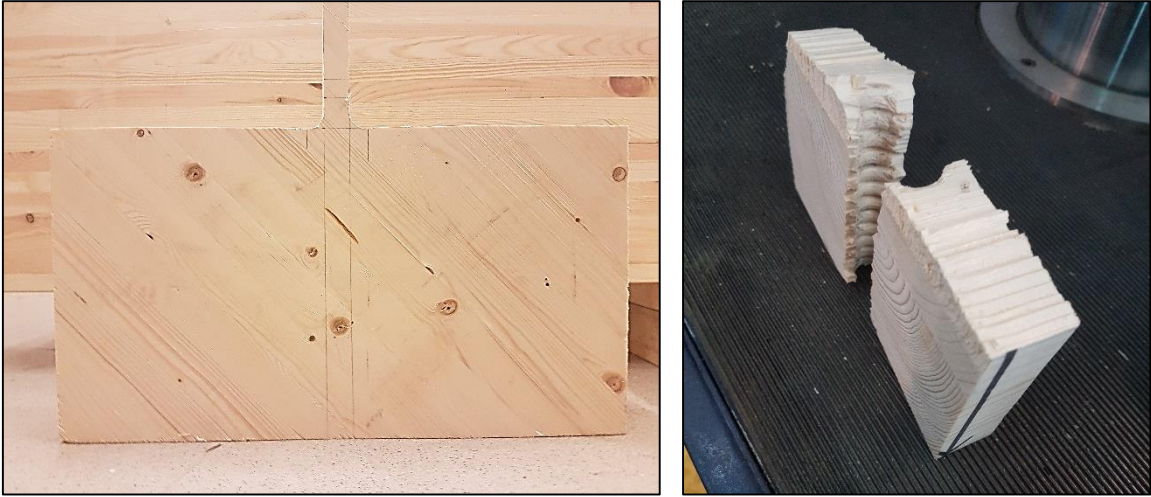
Specimen with new screwed-in length (left), removed part surrounding the rod (right)
